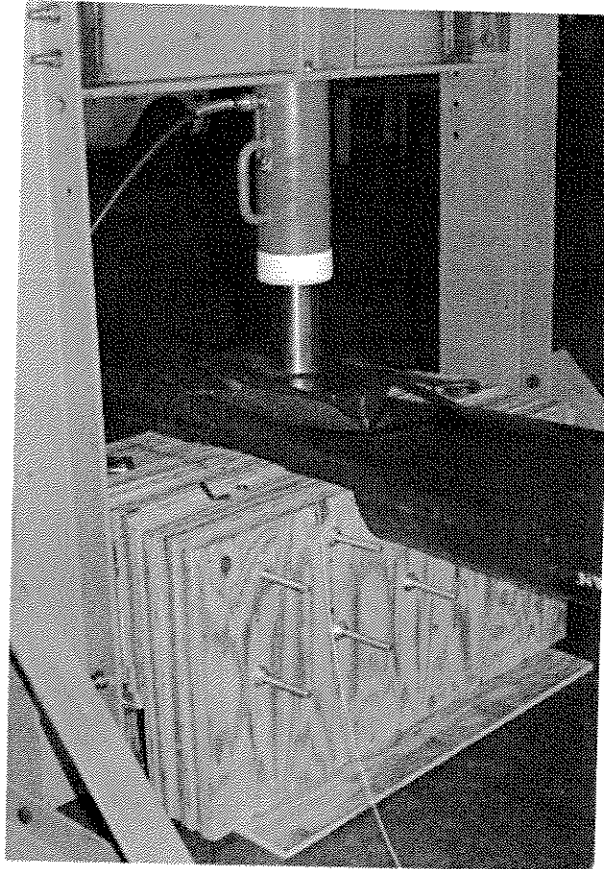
Indentor Head and Typical Dent for 12.75 in. Specimens
